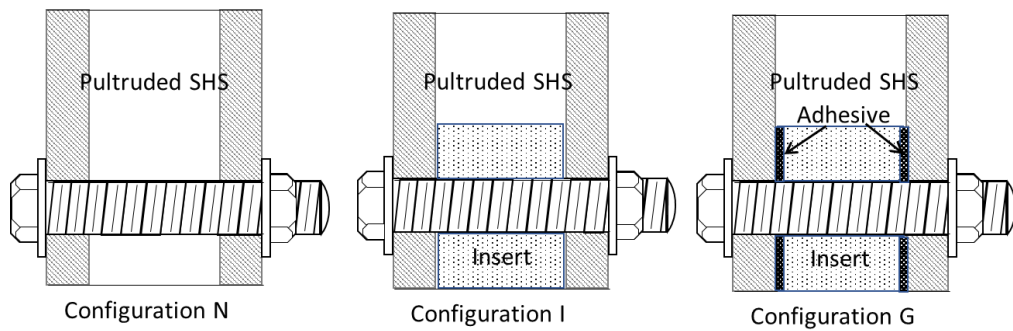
Illustration of the single-bolted joint configurations (cross-section view)
